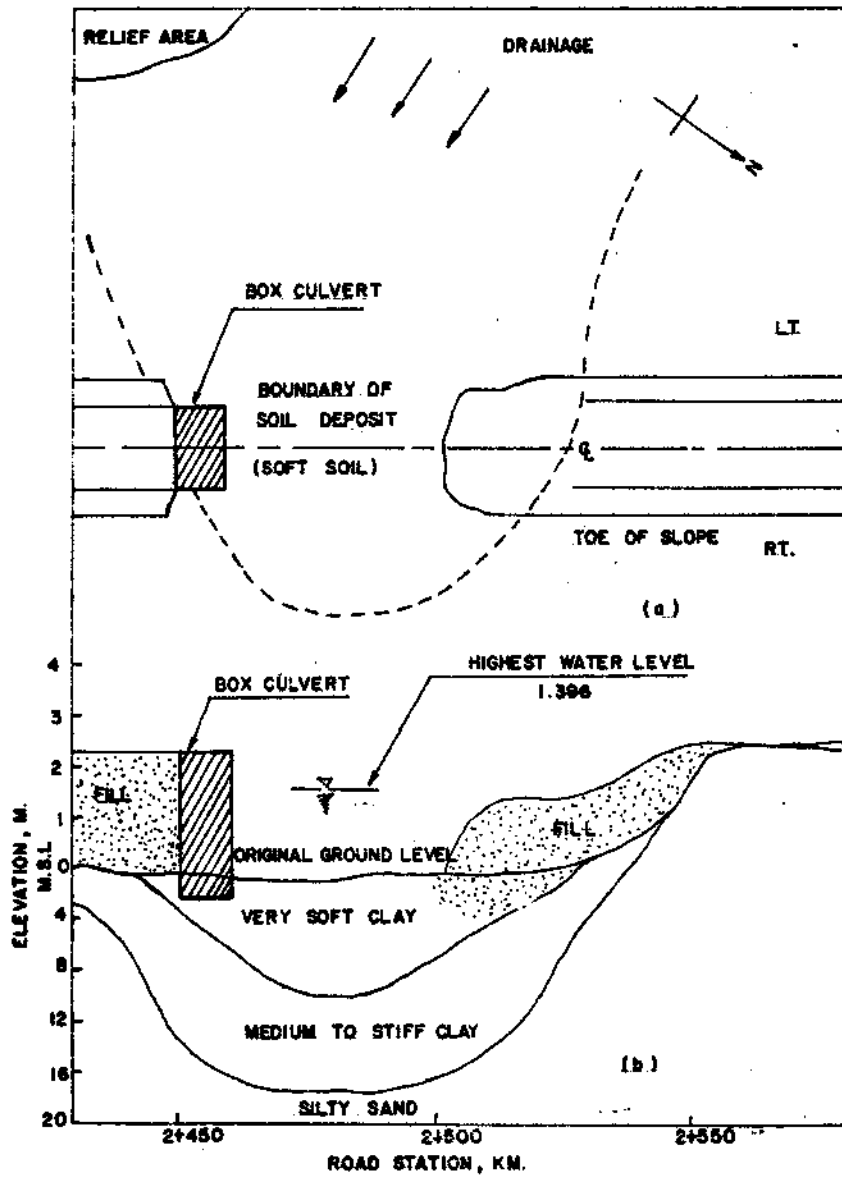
Plan and Profile along Center Line of Road at Test Area.
